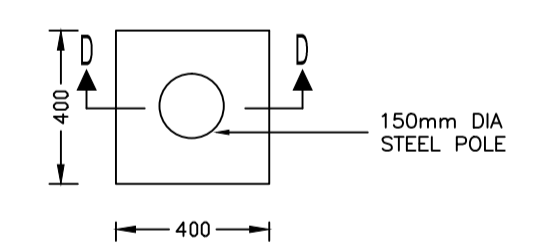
J: PLAN FOR FOOTING OF CONTROLLER BOX
